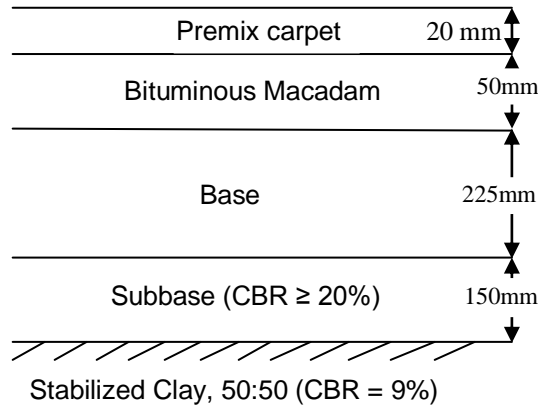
Pavement Structure for stabilized clay for 2 msa
